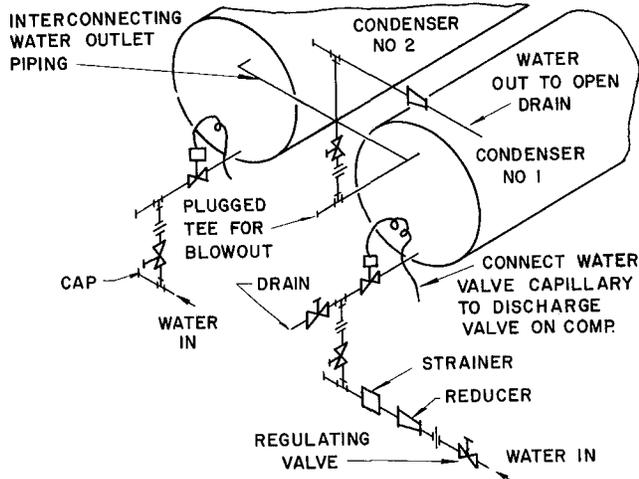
50BA024 Typical Waste or City Water Piping
